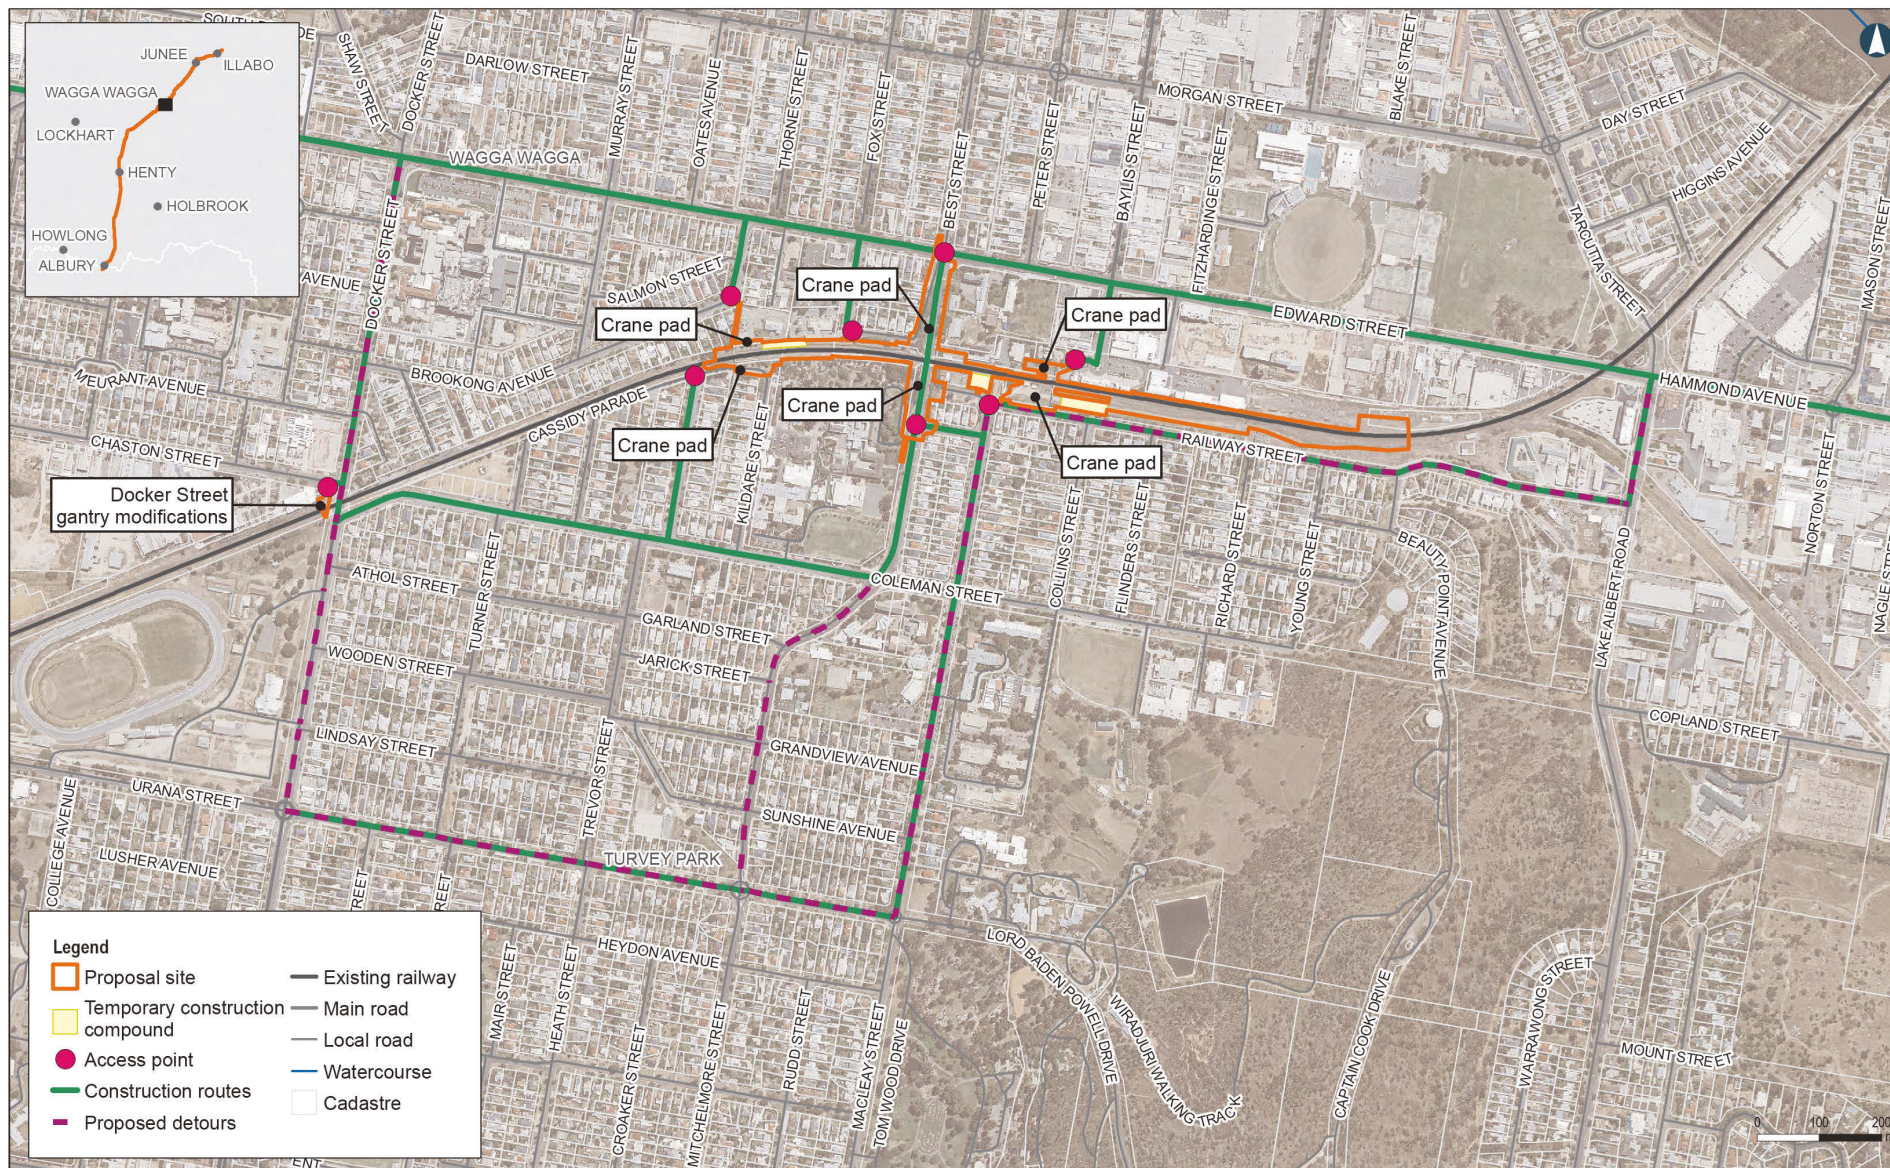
Construction layout of Wagga Wagga Station and surrounds
